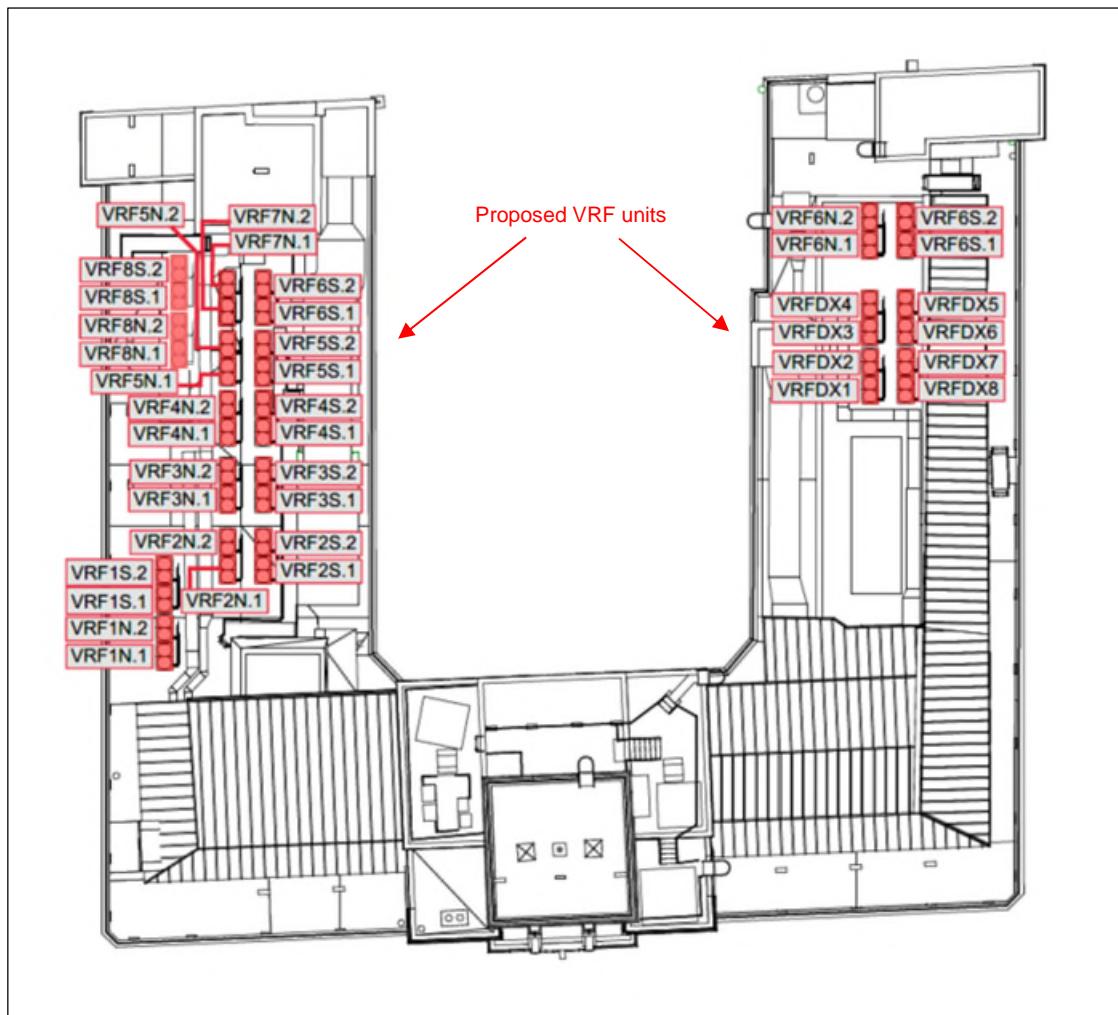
9th Floor Plan Showing Location of Proposed VRF Units
